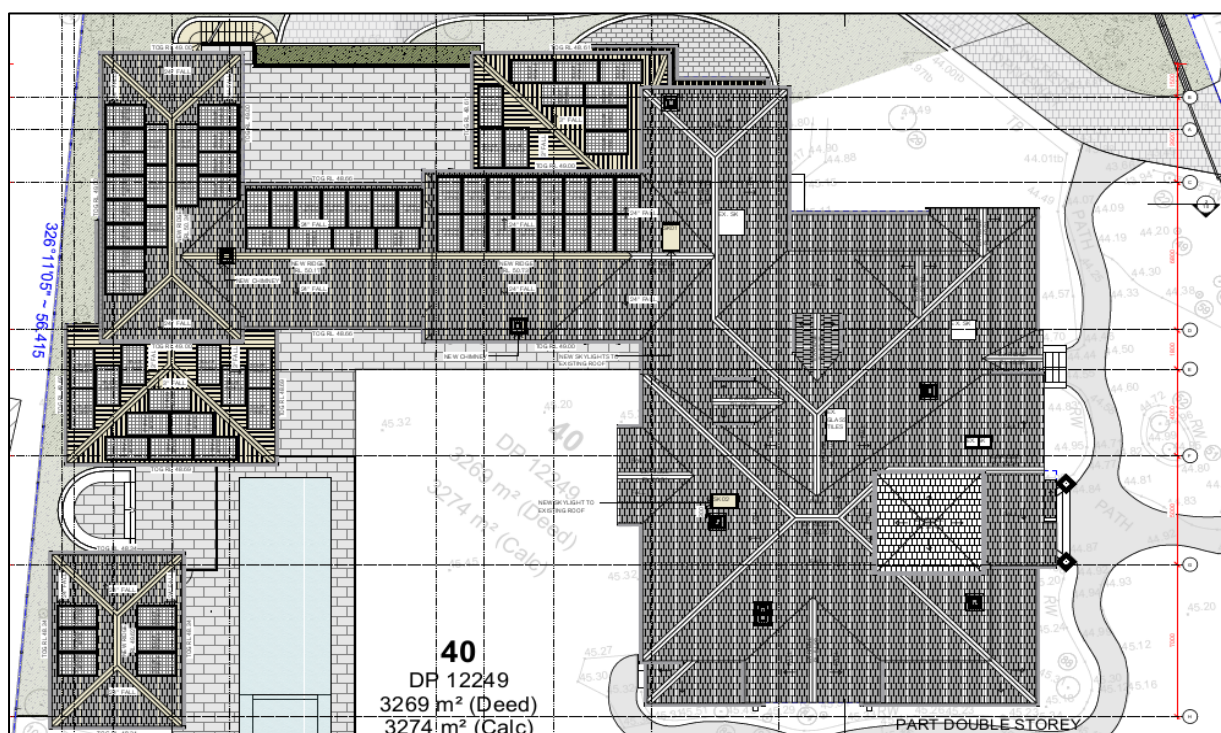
Extract of the applicant's submitted revised Roof Plan.
